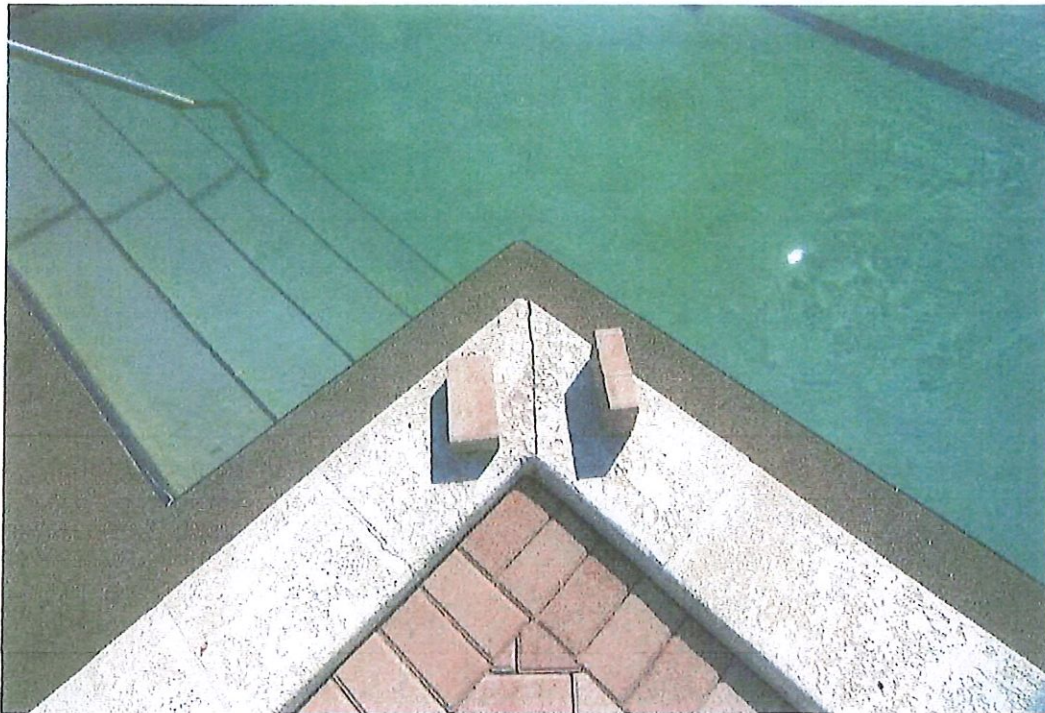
VIEW OF CRACKED MORTAR JOINT BETWEEN ADJOINING COPING STONES
